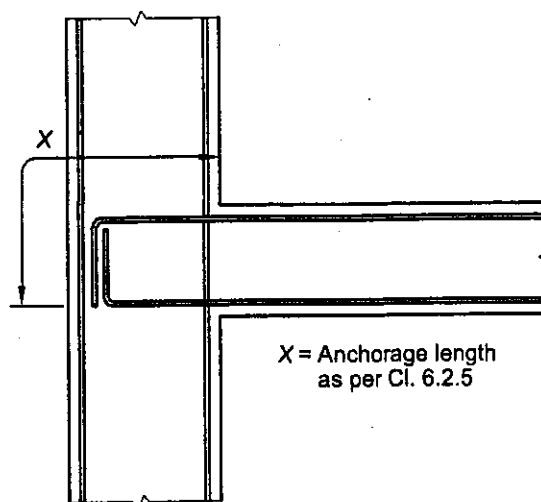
ANCHORAGE OF LONGITUDINAL BEAM BARS
